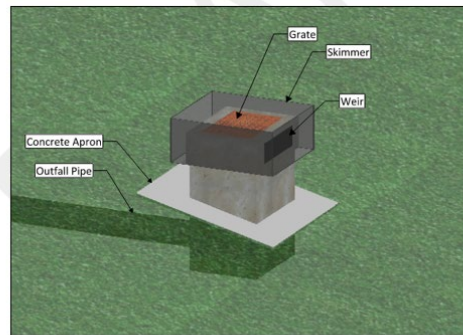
Typical Dry Retention Pond Control Structure – Isometric View (Not to scale) [Return to List of Figures](#)
